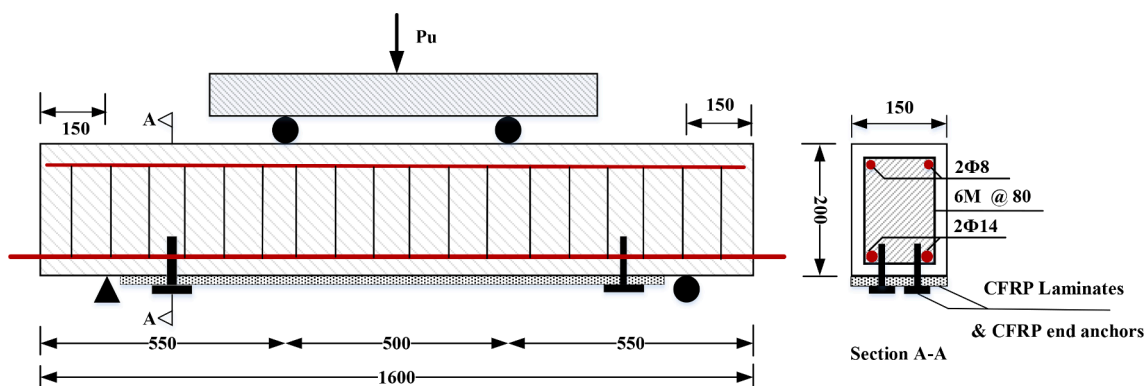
The geometry and reinforcement details of concrete beams (dimensions in millimetre).
